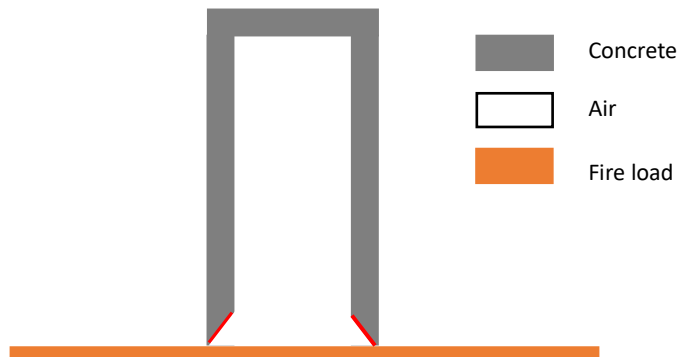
Location of calculated view factor at the diagonal parts at the bottom of the joint
